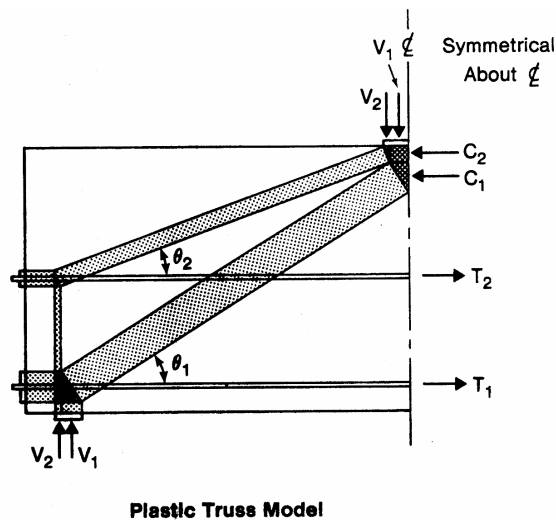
Plastic truss model for beam with horizontal web reinforcement (Rogowsky and MacGregor 1983)
